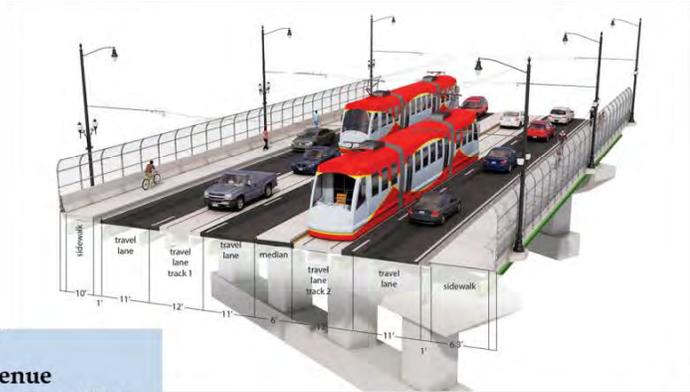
Build Alternative 2 Typical Sections (Wireless Propulsion System)
